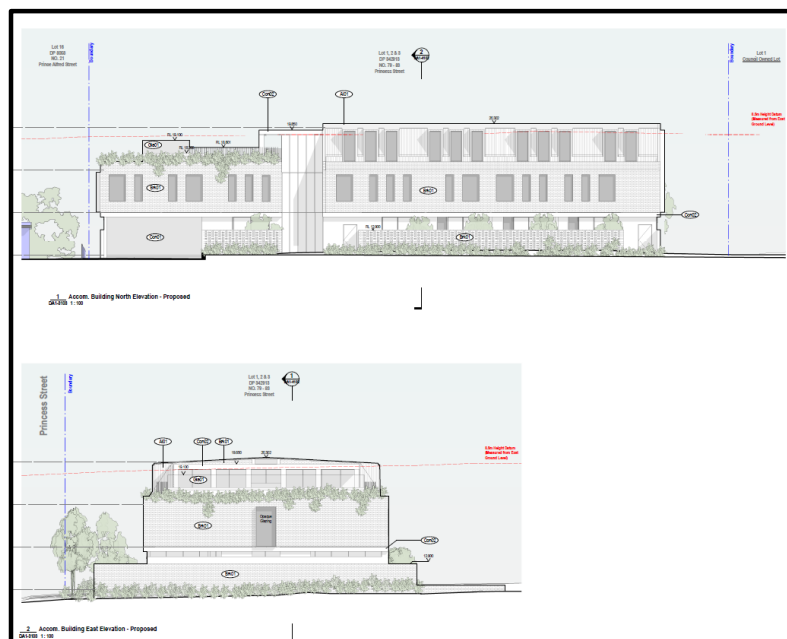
Motel Accommodation Elevation (North and East) (Source: H&E Architects).
